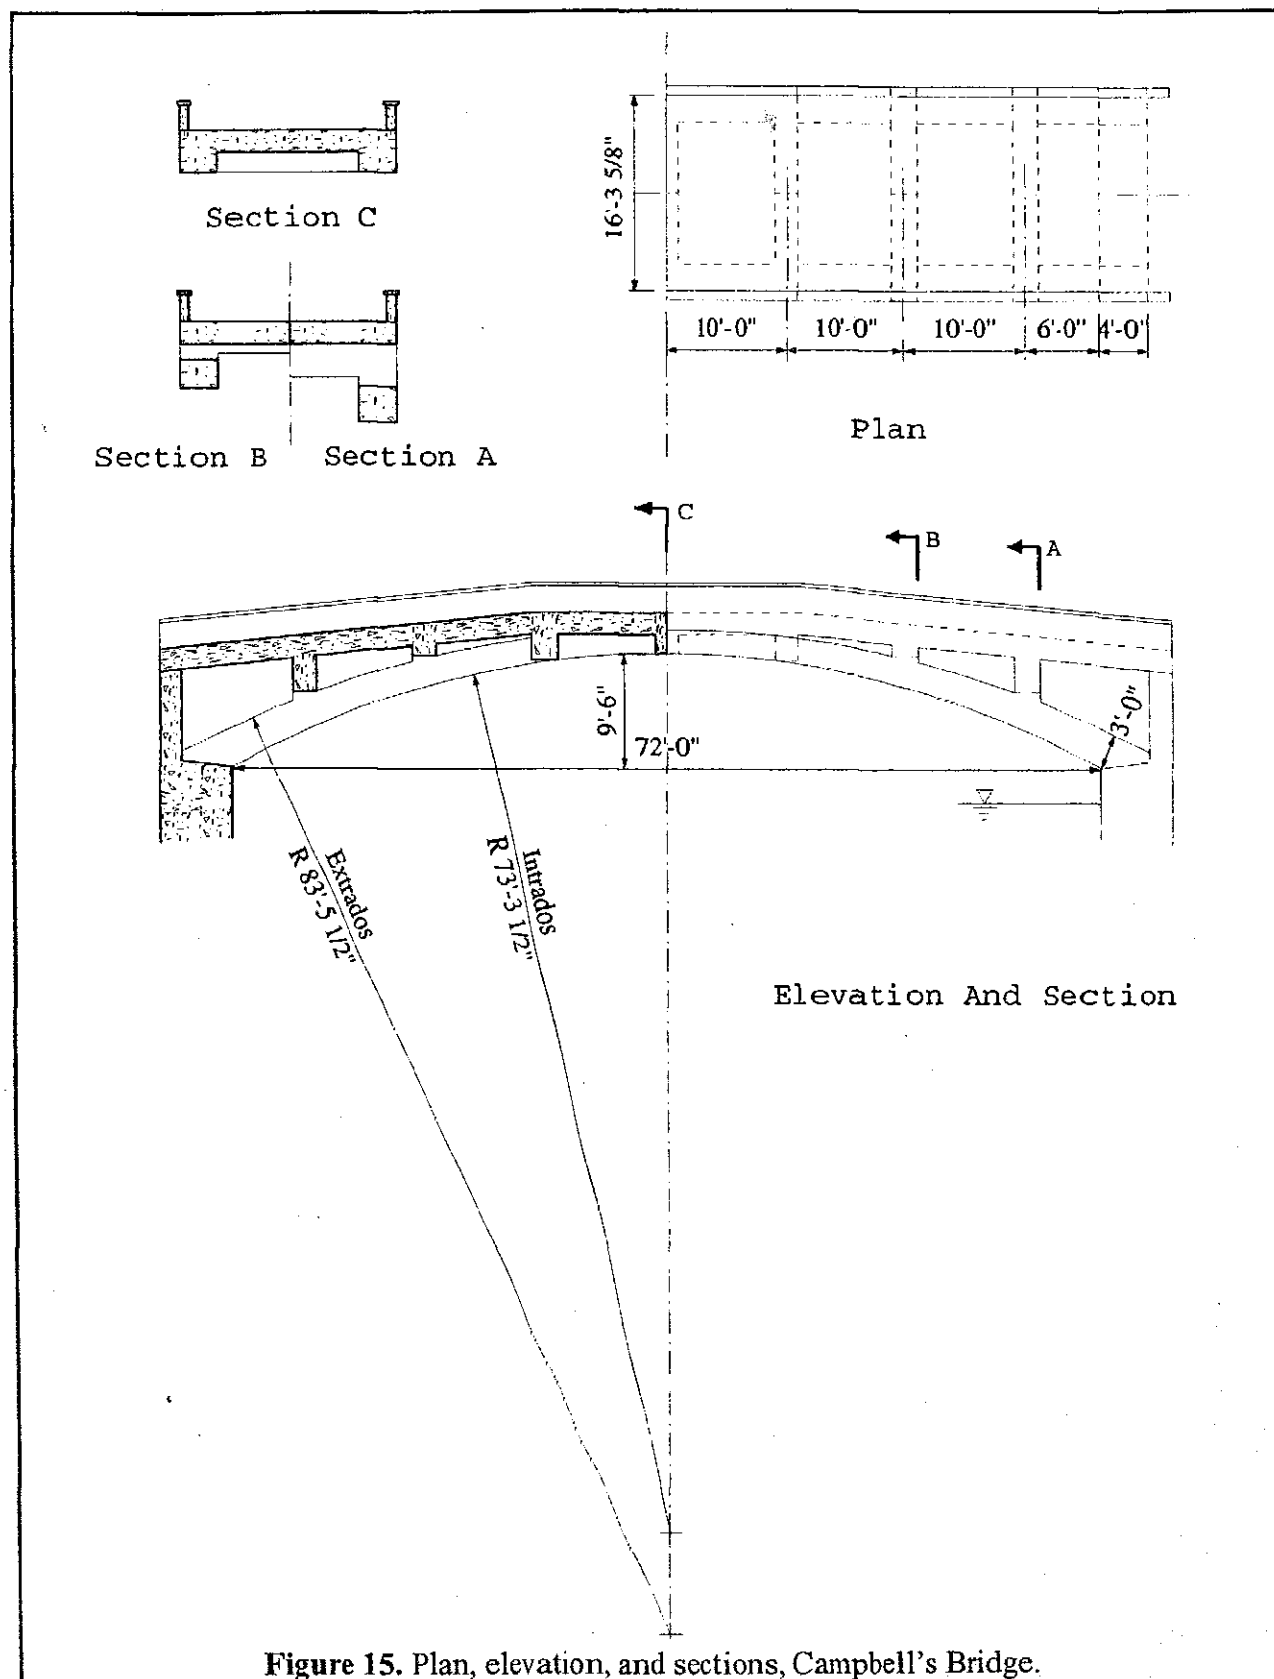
Plan, elevation, and sections, Campbell's Bridge.
